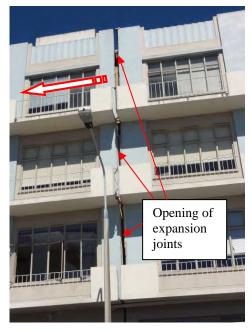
Stretching of foundations due to lateral spreading resulting in opening of the expansion joints
